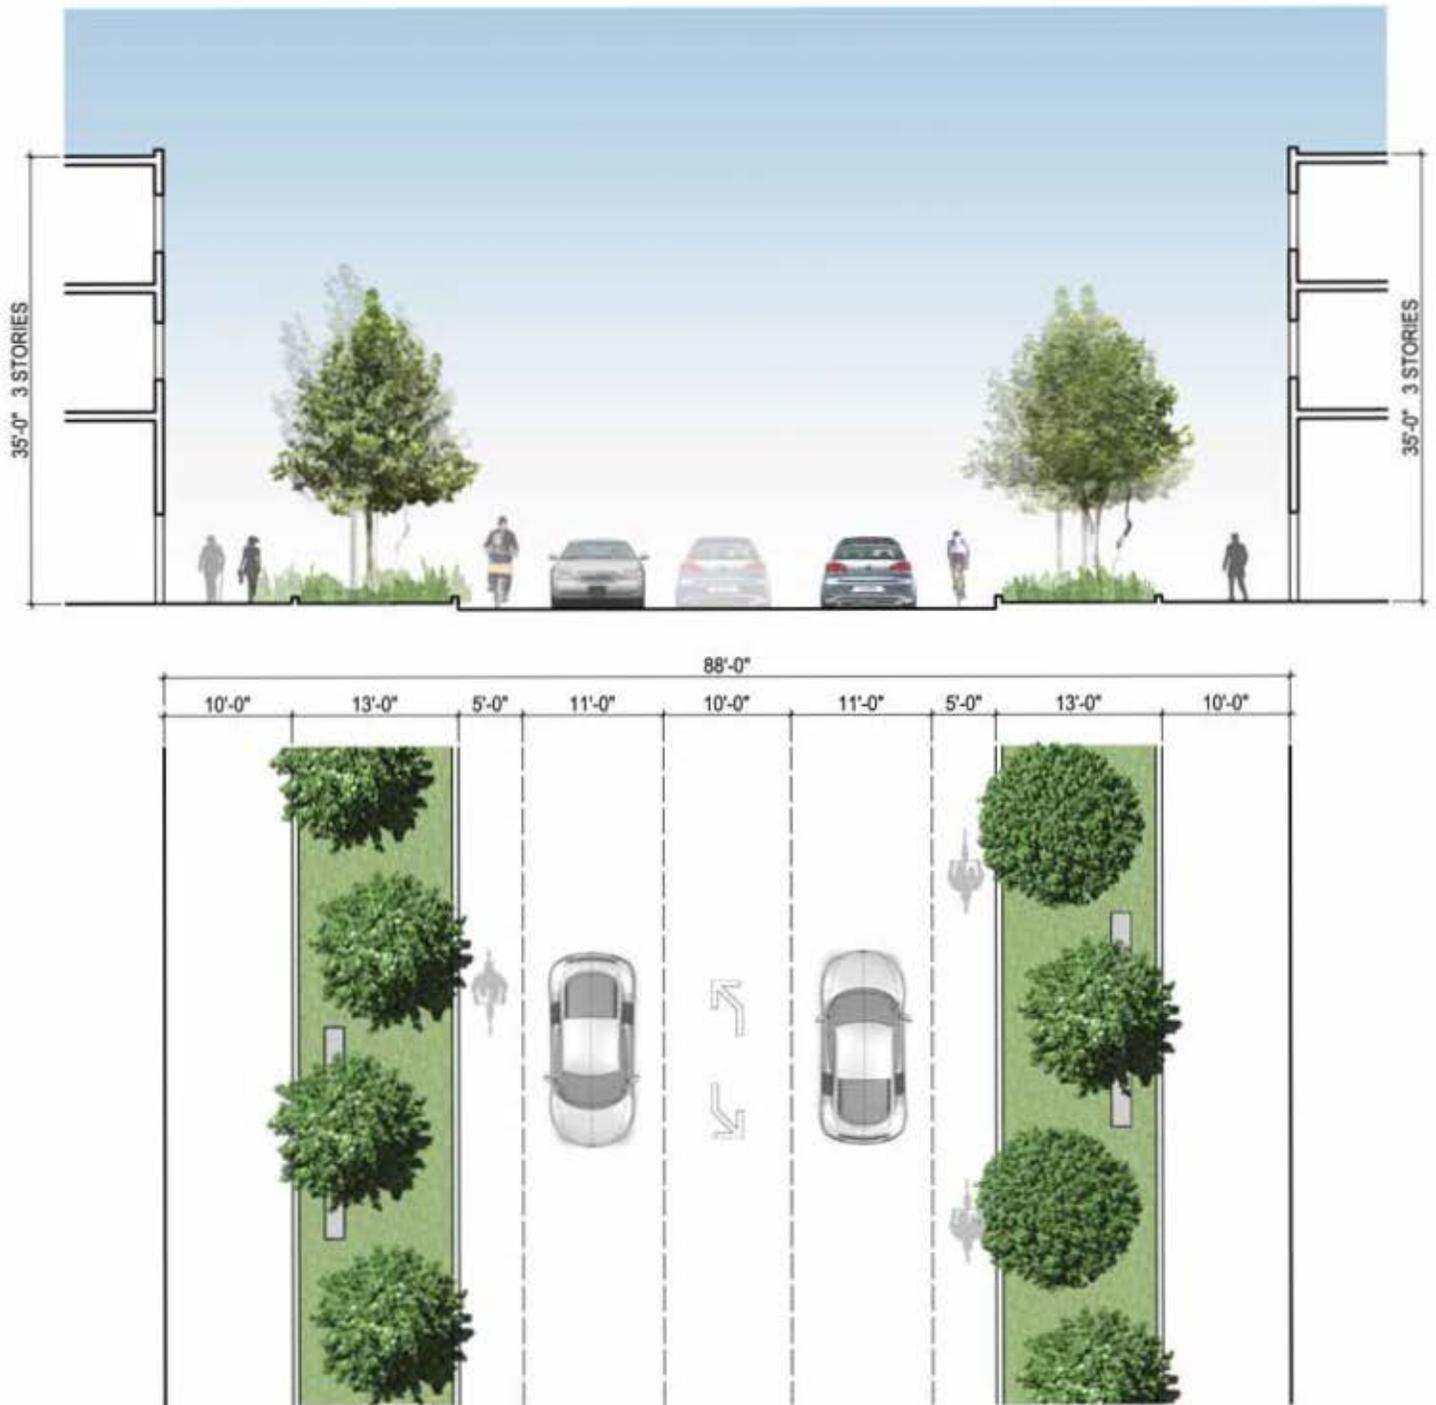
Street Plan and Section - Hallock Ave. to Rt. 347 with bicycle lane and planting strip
